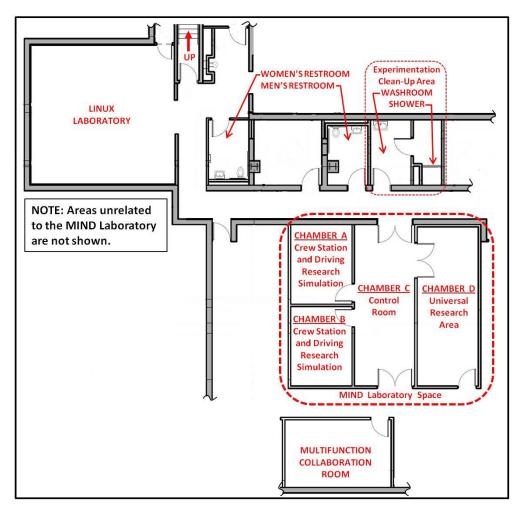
Basement floor plan: MIND Laboratory space and supporting facilities.
